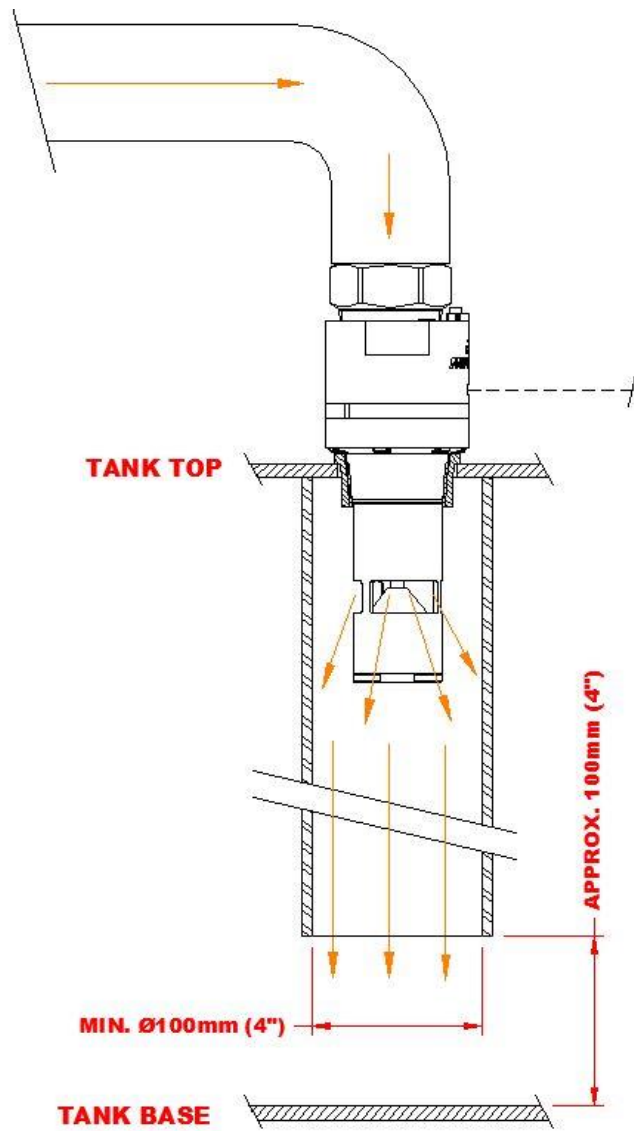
BFCV50E Installed Within Vertical Drop Pipe
